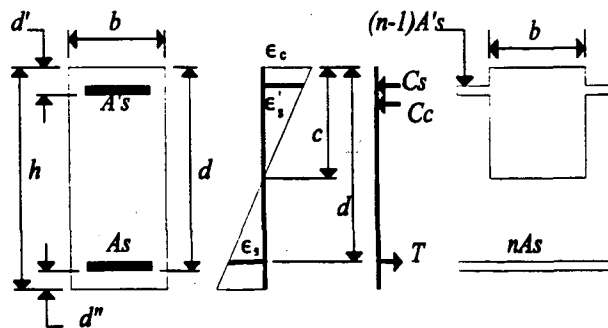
Internal forces and strains in cracked rectangular section with tension and compression reinforcement
